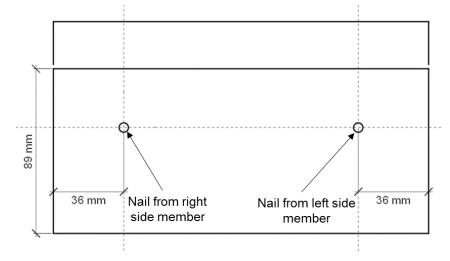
Nail locations for specimens with nails perpendicular to wood grain
